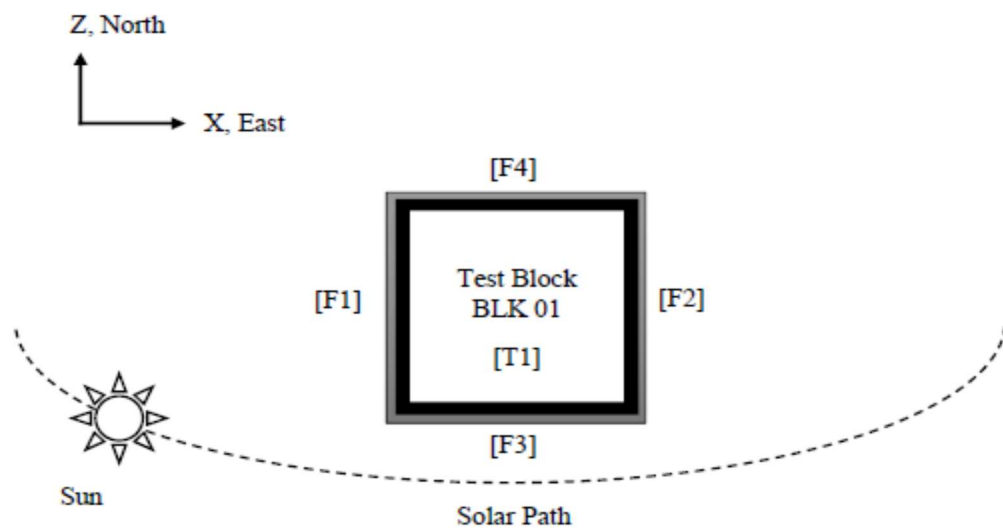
Plan View - Geometric Orientation of Test Block BLK 01
